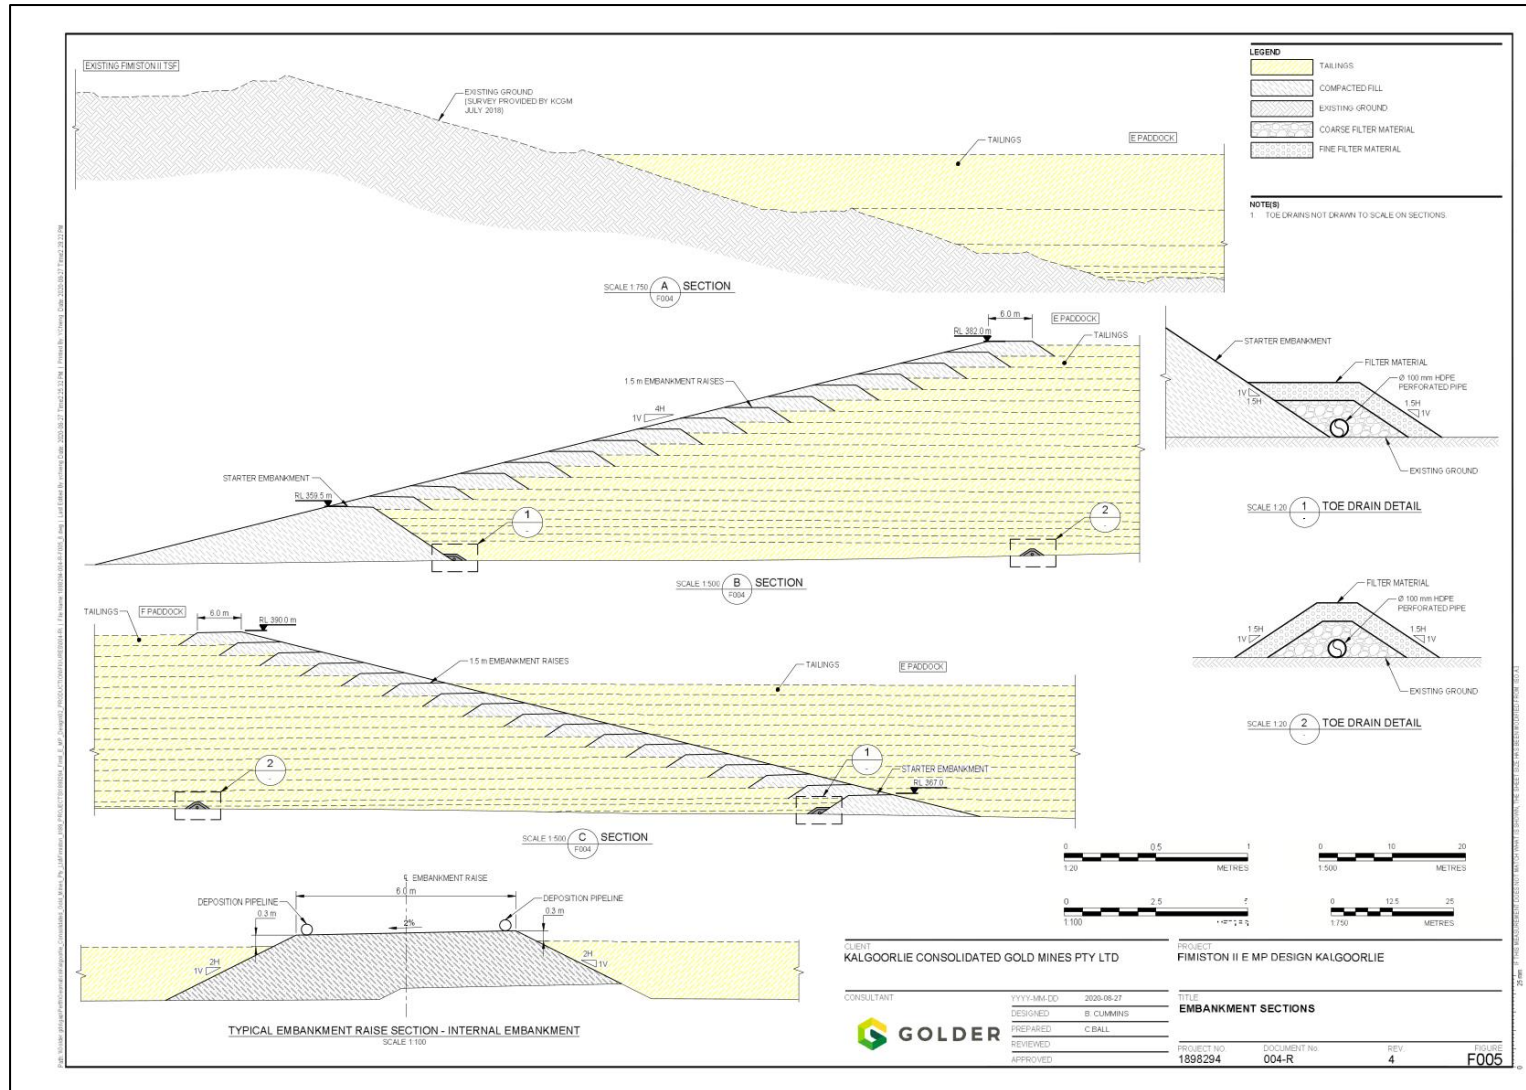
Fimiston II Extension TSF Cell E and F typical embankment raise details
